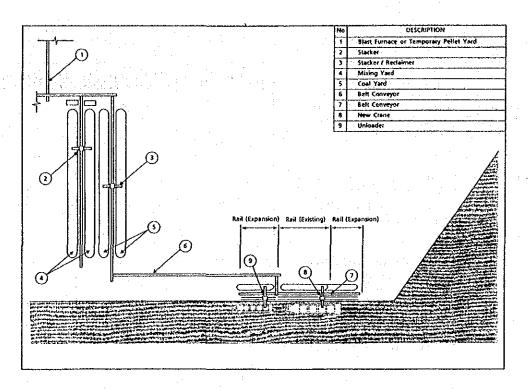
General Plan for Expansion, Sicartsa Berth, Lazaro Cardenas
